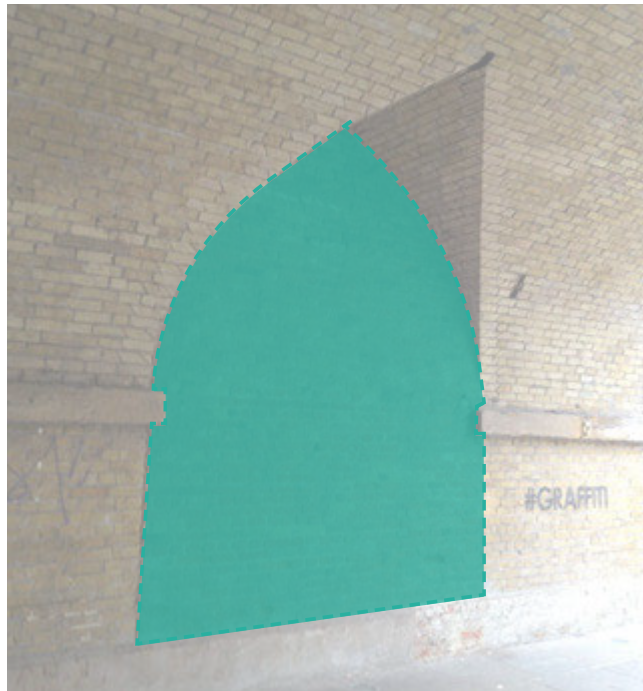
Proposed re-opening of cross arch, Braithwaite Street
